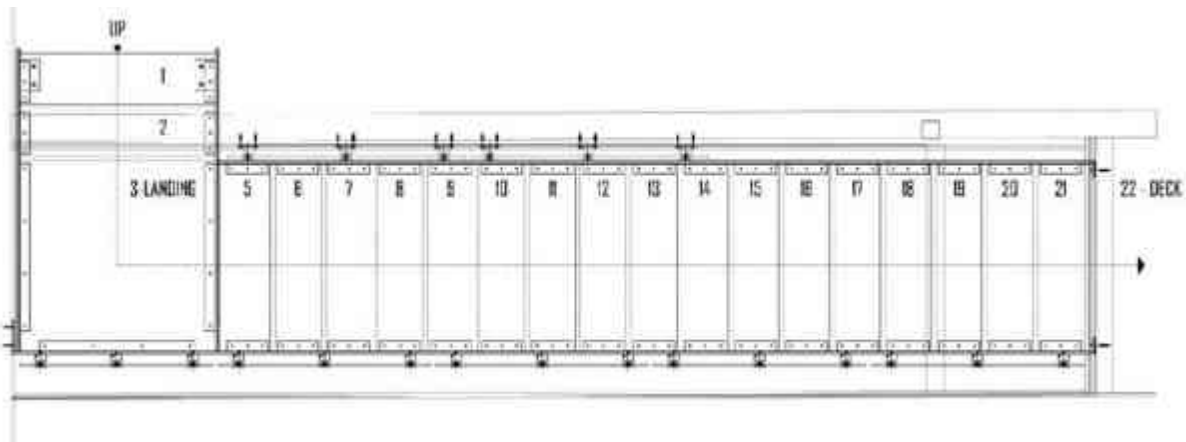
"L" Stair at Second Floor with one landing / 4515 20th Street
